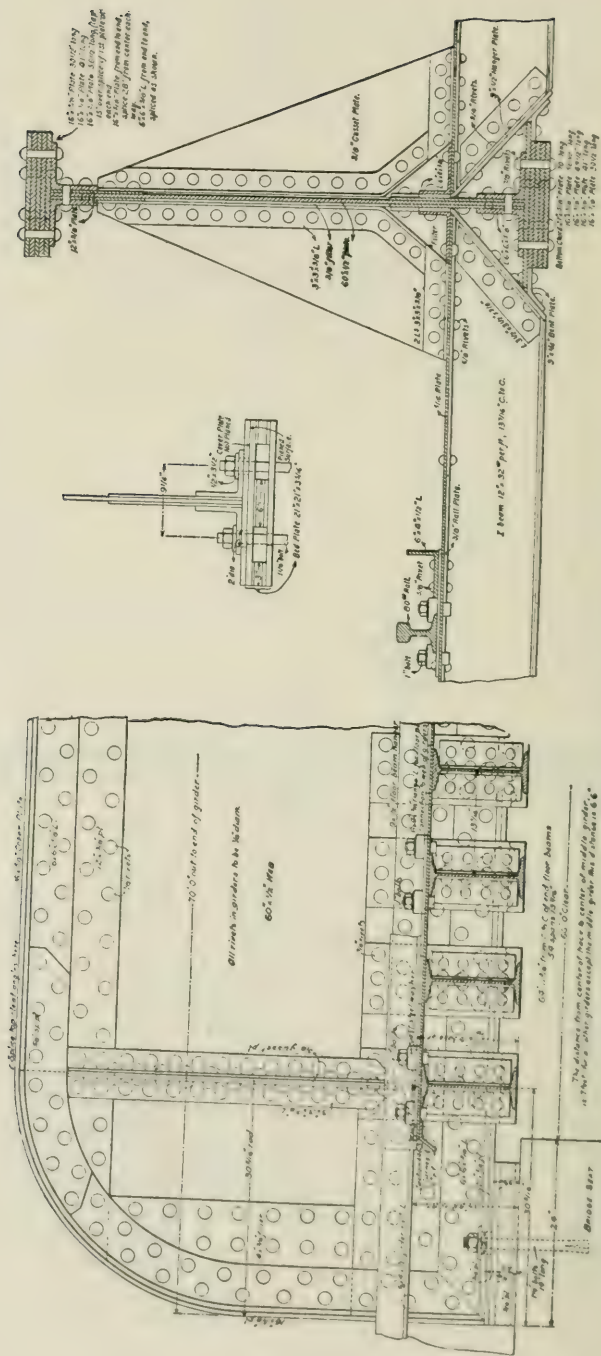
Details Standard Bridge showing I Beam Connection, 1896.
